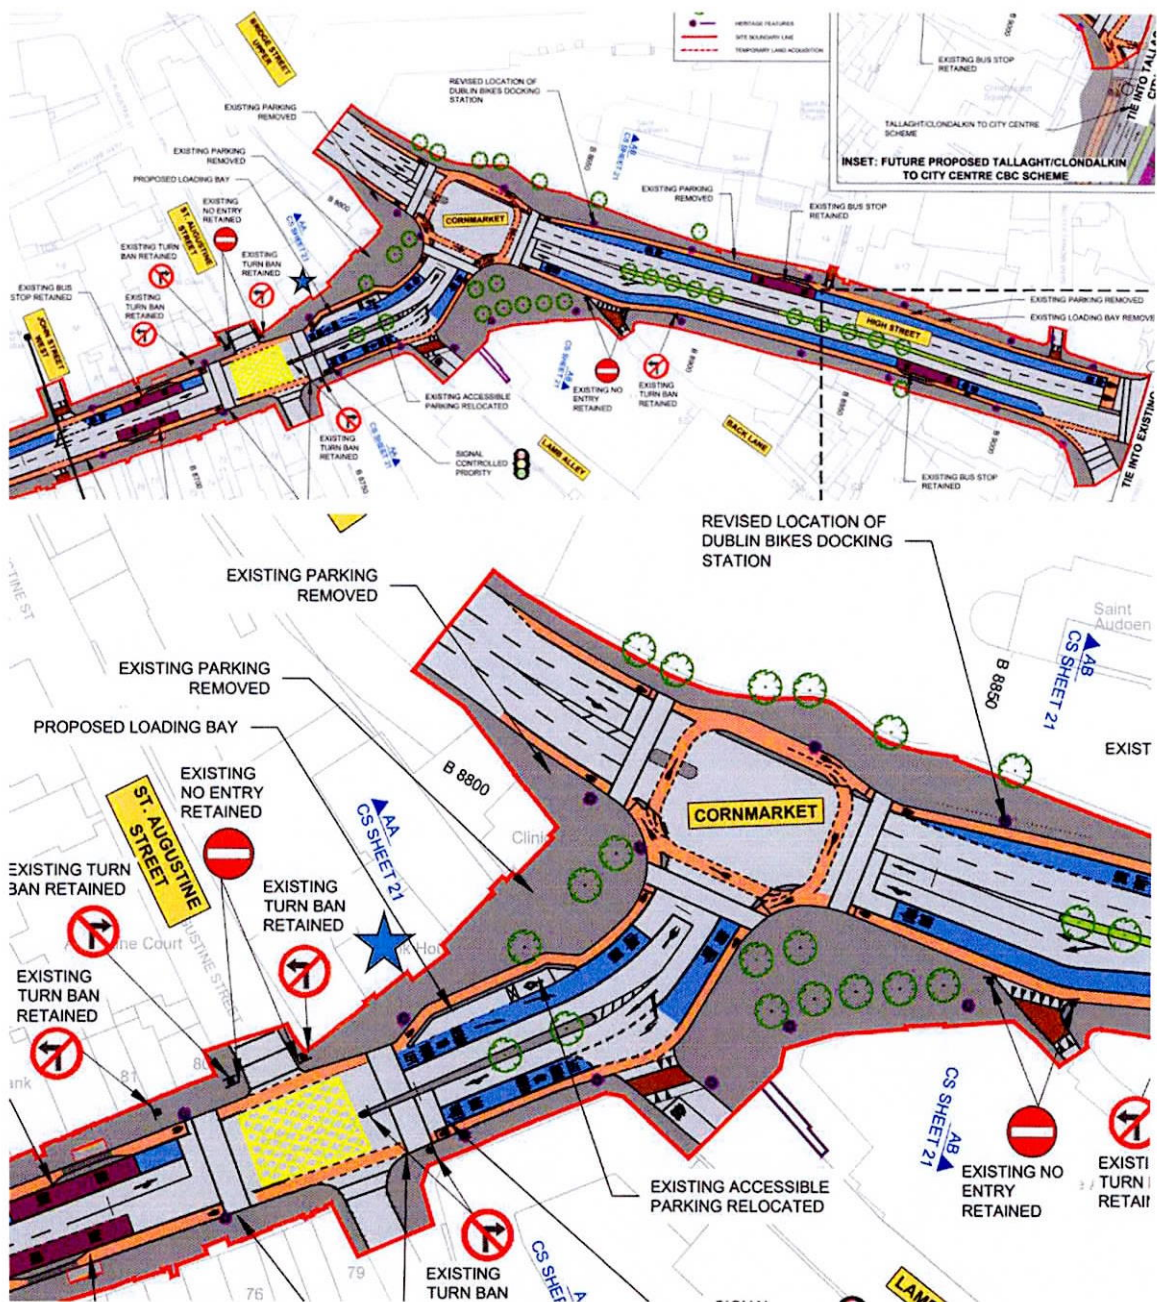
Extracts from Sheet 28 of the General Arrangement drawing illustrating the proposed works relative to our client's site (blue star).
